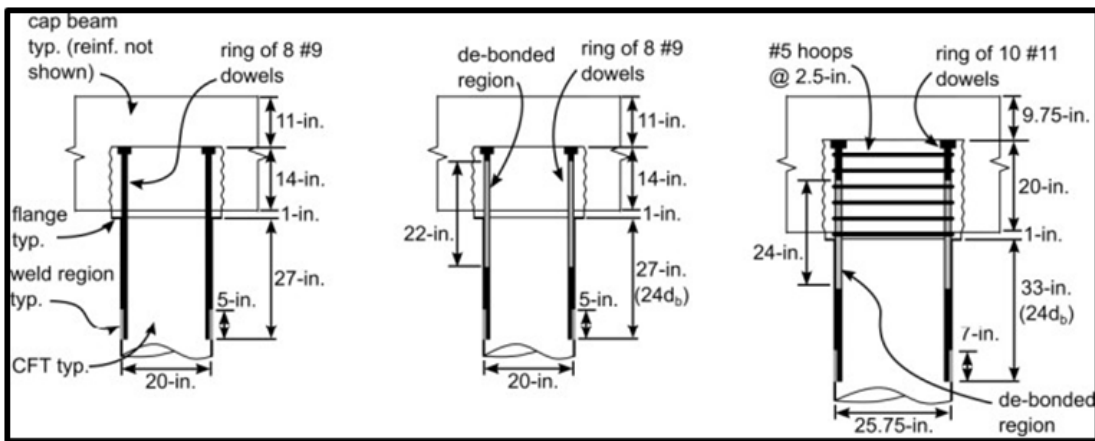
Caltrans: Annular ring detail for pile to bent cap connection with welded dowels
